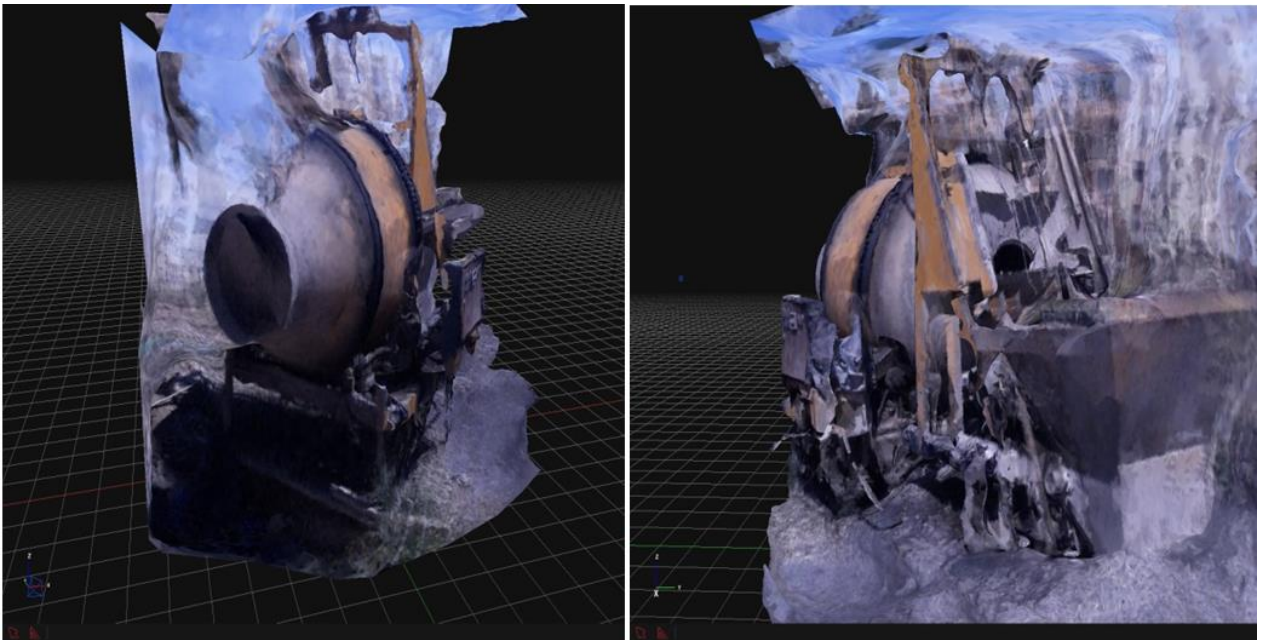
SfM Reconstruction of the Concrete Mixing Machine (Ours)
